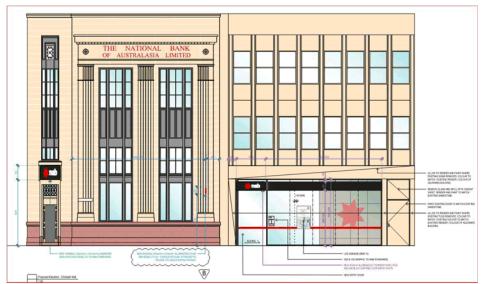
proposed signage on the Elizabeth Street Mall elevation and above the entry doors on the corner of Liverpool St and the Elizabeth Street Mall
